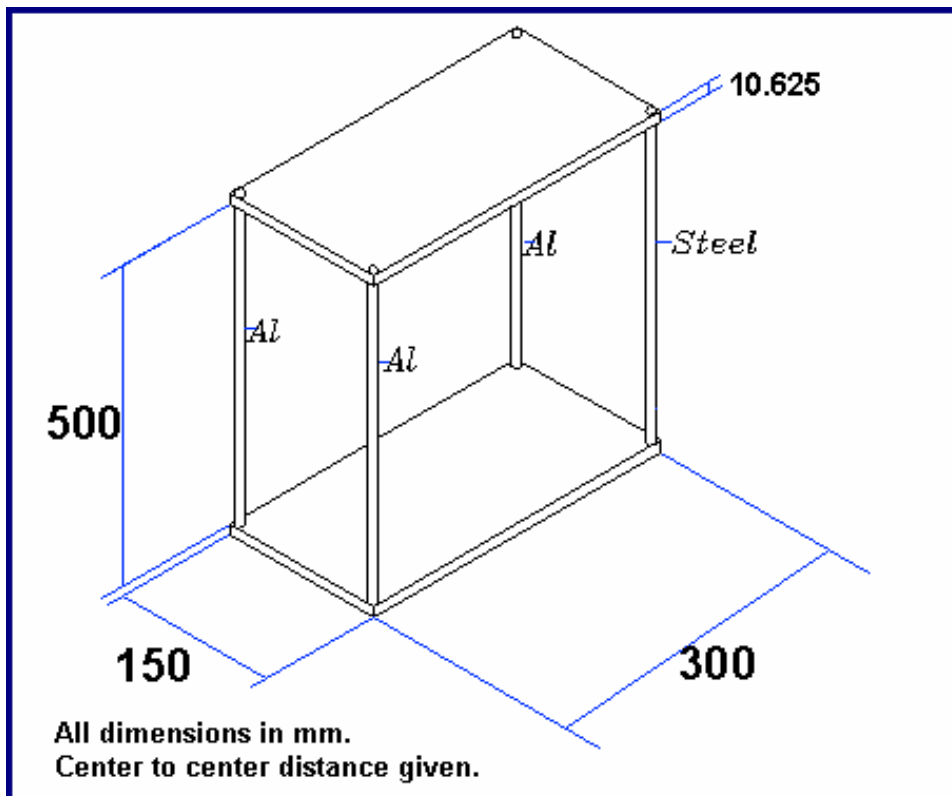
Schematic diagram of one-story frame with planar asymmetry.
